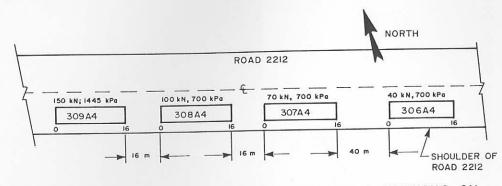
(a) LAYOUT OF THE VARIOUS HVS TEST SECTIONS ON ROAD 2212, BULTFONTEIN
